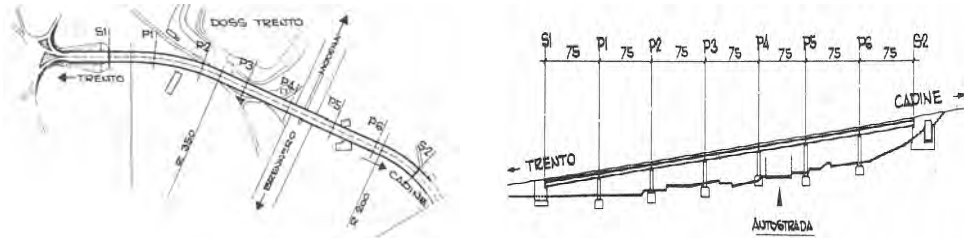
Plan and longitudinal section of the viaduct after Boller et al. (1984). Dimensions in m.
